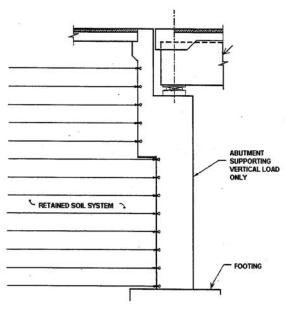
"False" Abutment with Concrete Abutment For Vertical Loads.
